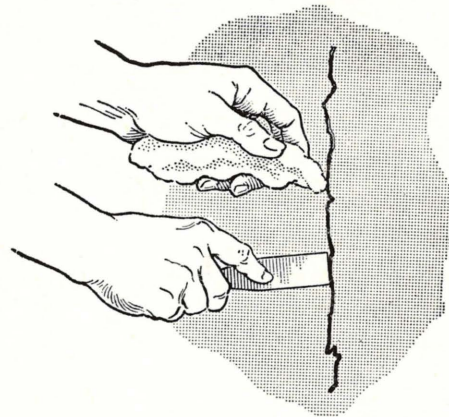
Fill cracks in a plastered wall with putty
